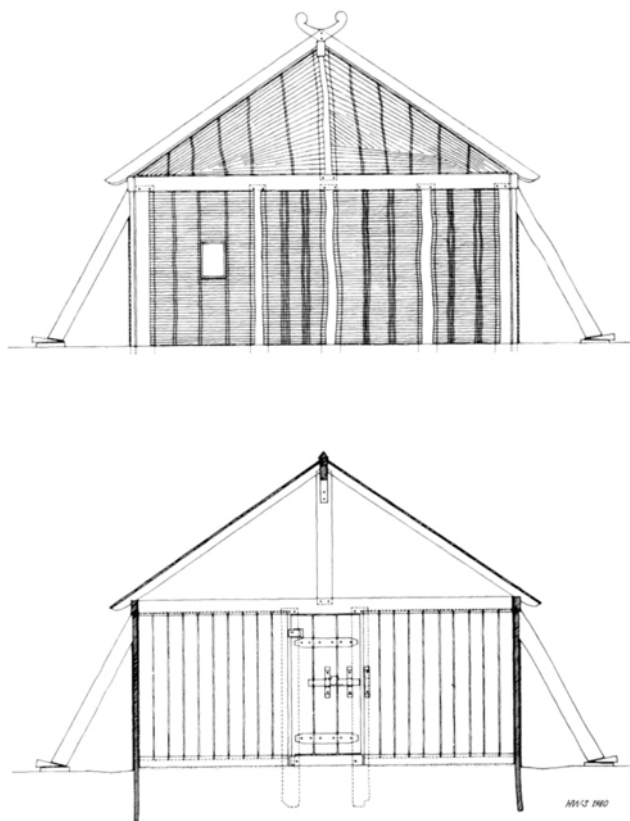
Reconstruction of a Hedeby house built A.D. 870. A window-frame was preserved with the wattle-panels of the gable. Elevation and section, scale 1:100. H.S. 1980.
